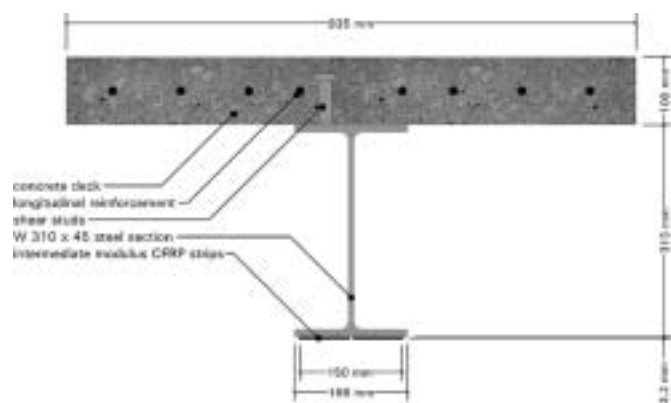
Cross-section of steel-concrete composite girder (CGAB-I).
